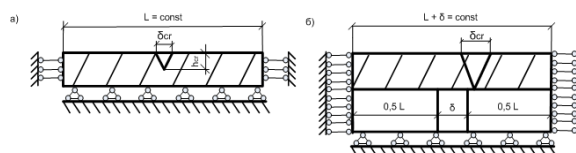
Design models for the calculation of stresses in asphalt concrete pavement after crack appearance:
